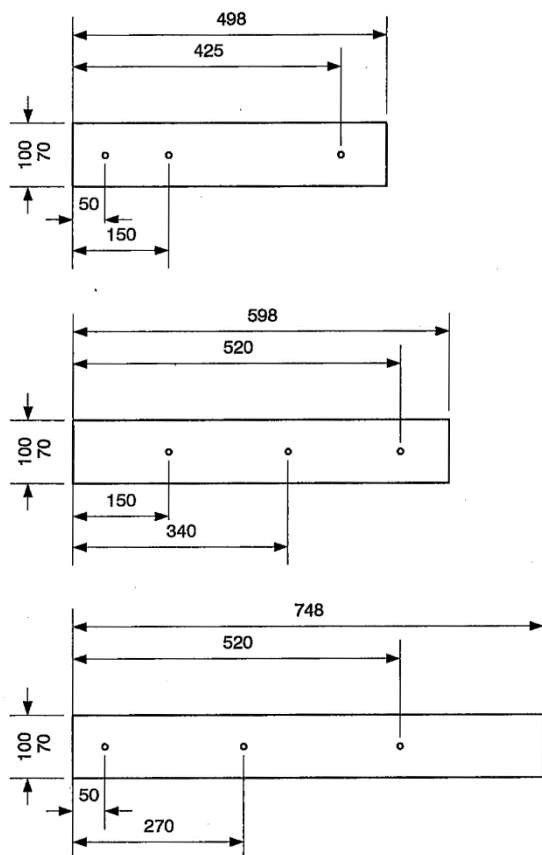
Cross section of the Ytong/Hebel wall panels and indicative the location of the non structural reinforcement
